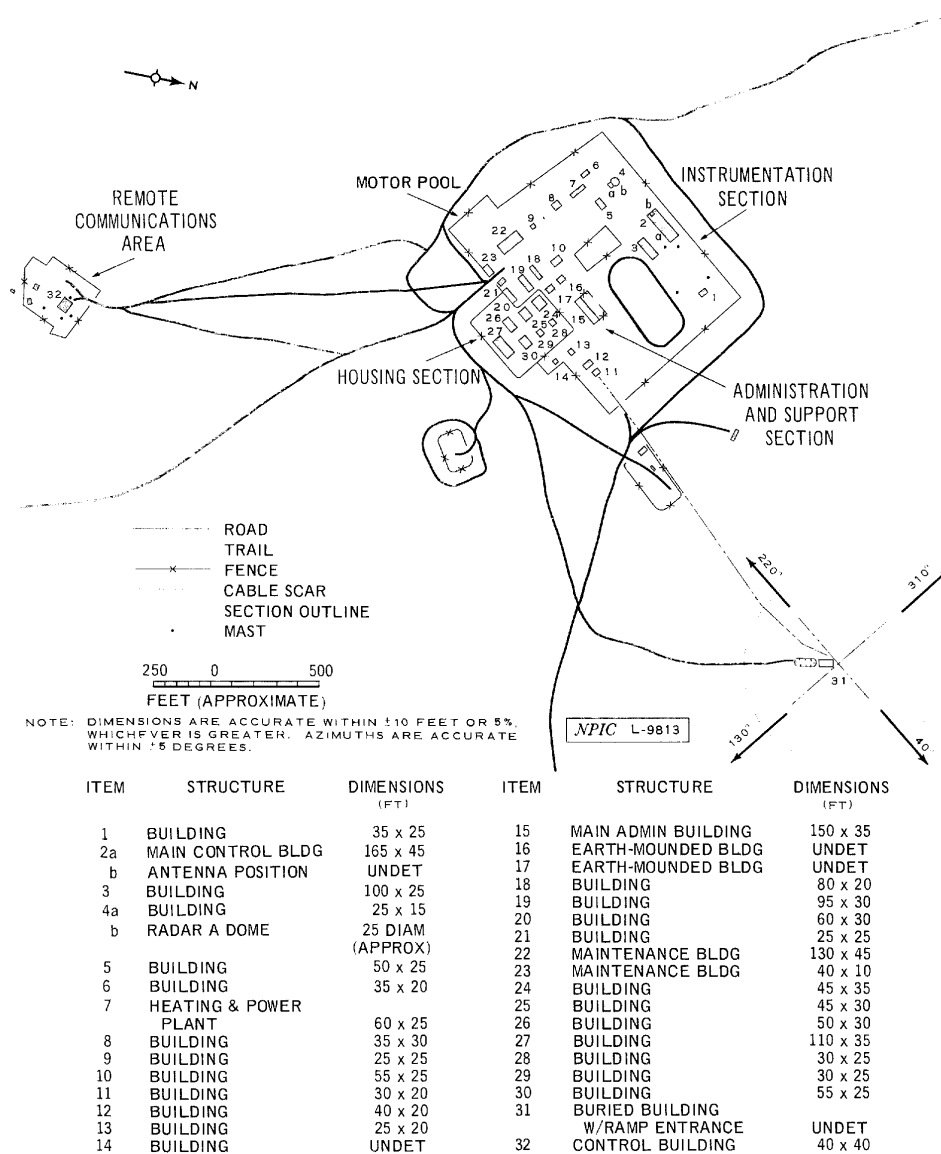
LAYOUT OF TRACKING FACILITY TT4.
